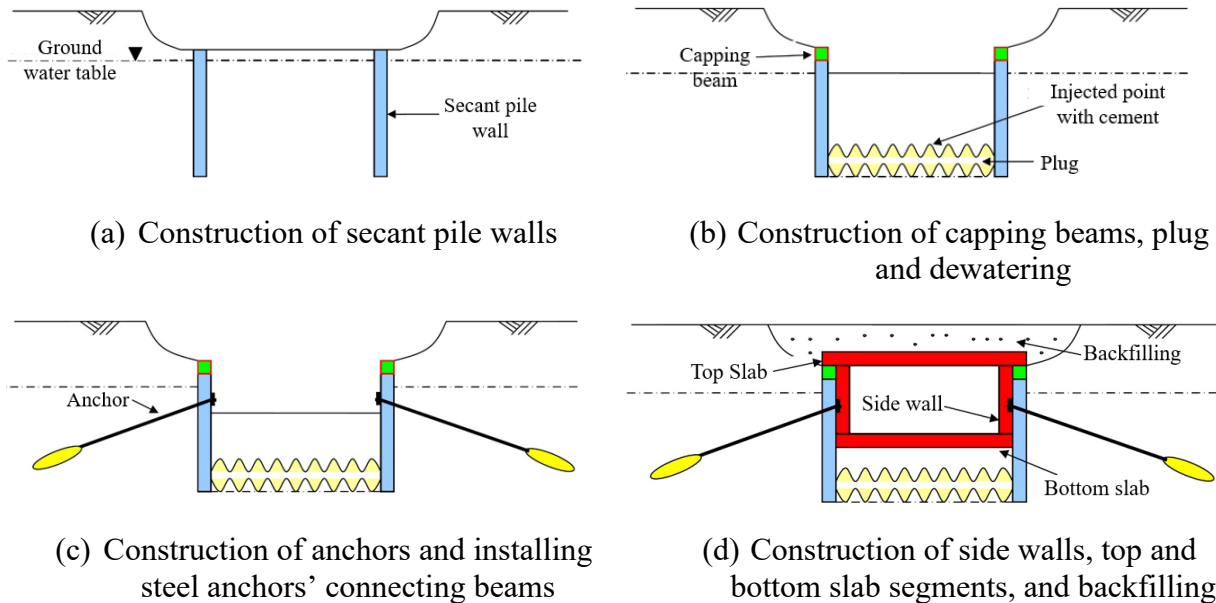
Construction process of C&C method using secant pile walls (Abdallah and Marzouk, 2013)
